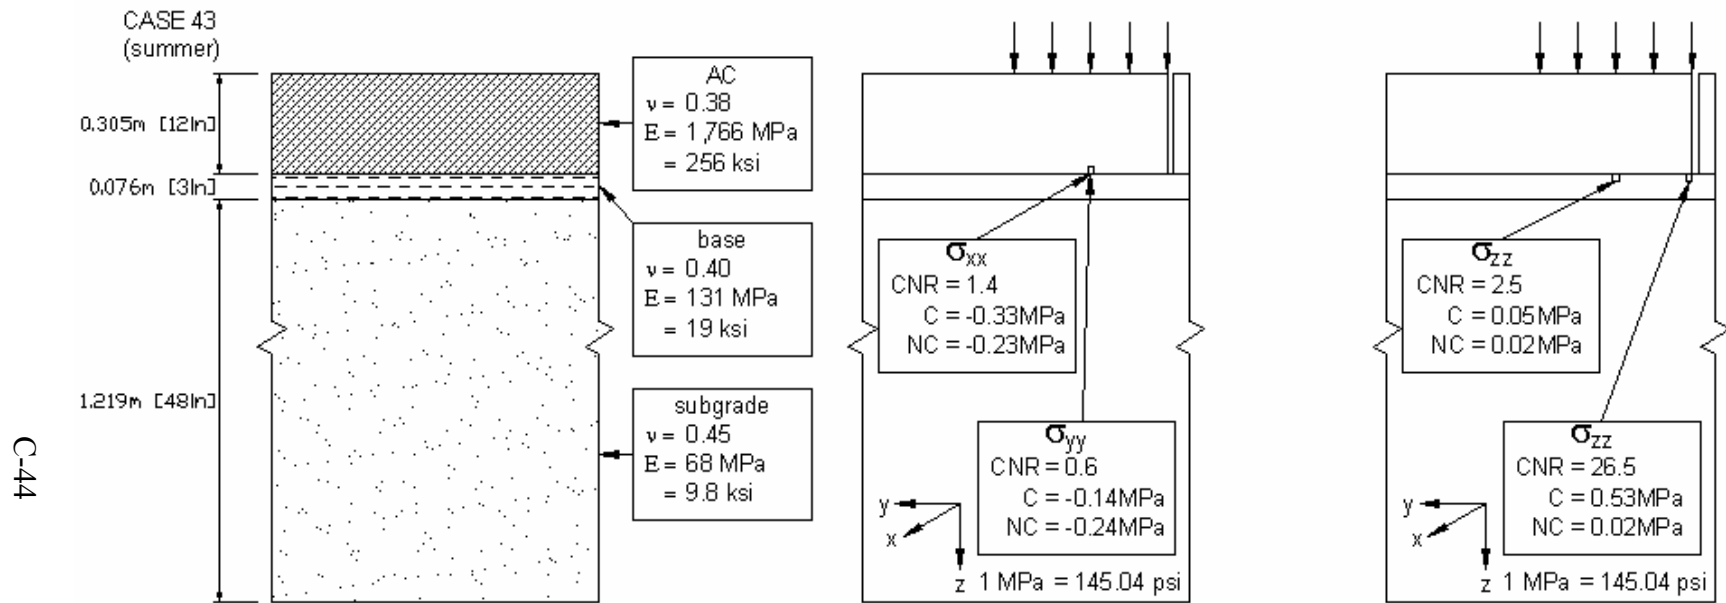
Summary cross section for case 43, (C – stress in cracked pavement, NC – stress in pavement with no crack, CNR – crack/no crack (stress) ratio)
